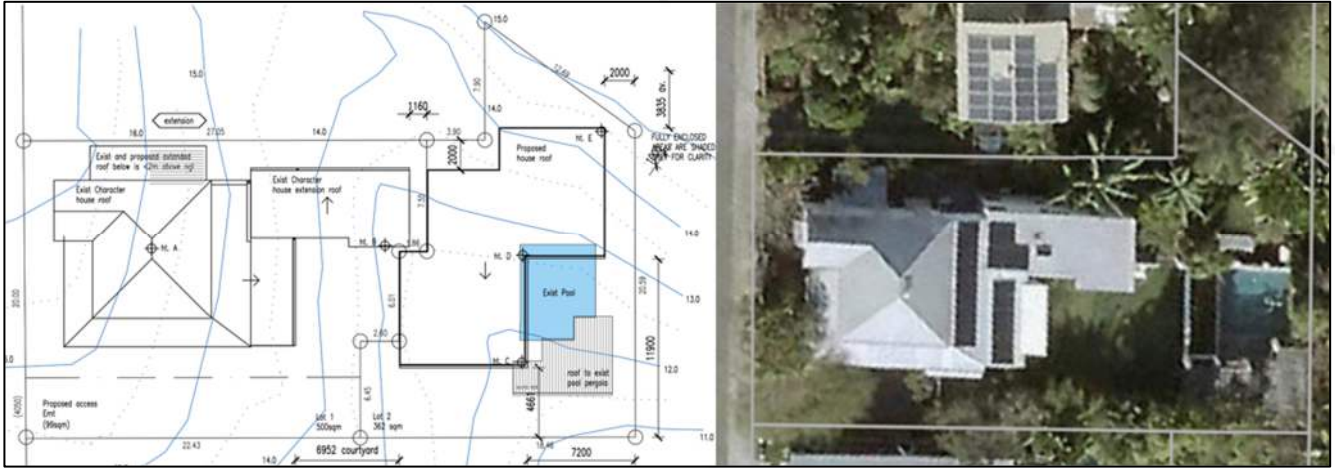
Proposed plans/aerial image of site (Source: Price Musgrave Architecture & BCC Mapping)
